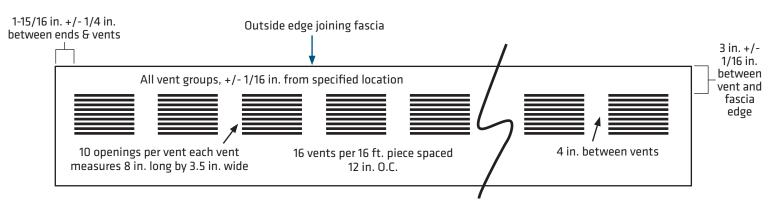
12 in. Cut to Width Soffit Framing Diagram
